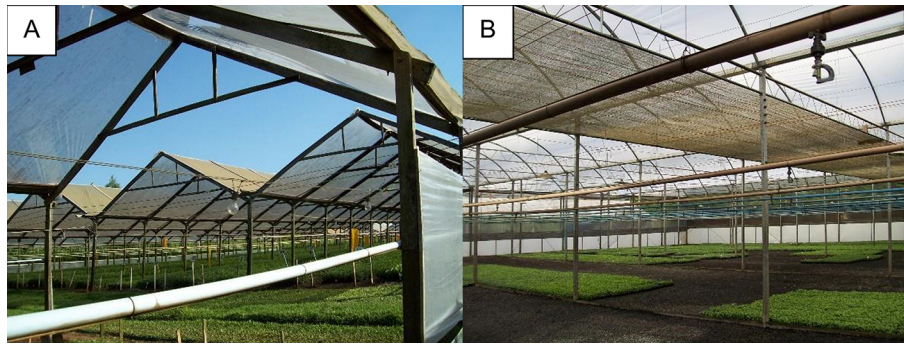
Greenhouses covered with plastic. (A) Wooden structural frame; (B) Steel structural elements.
